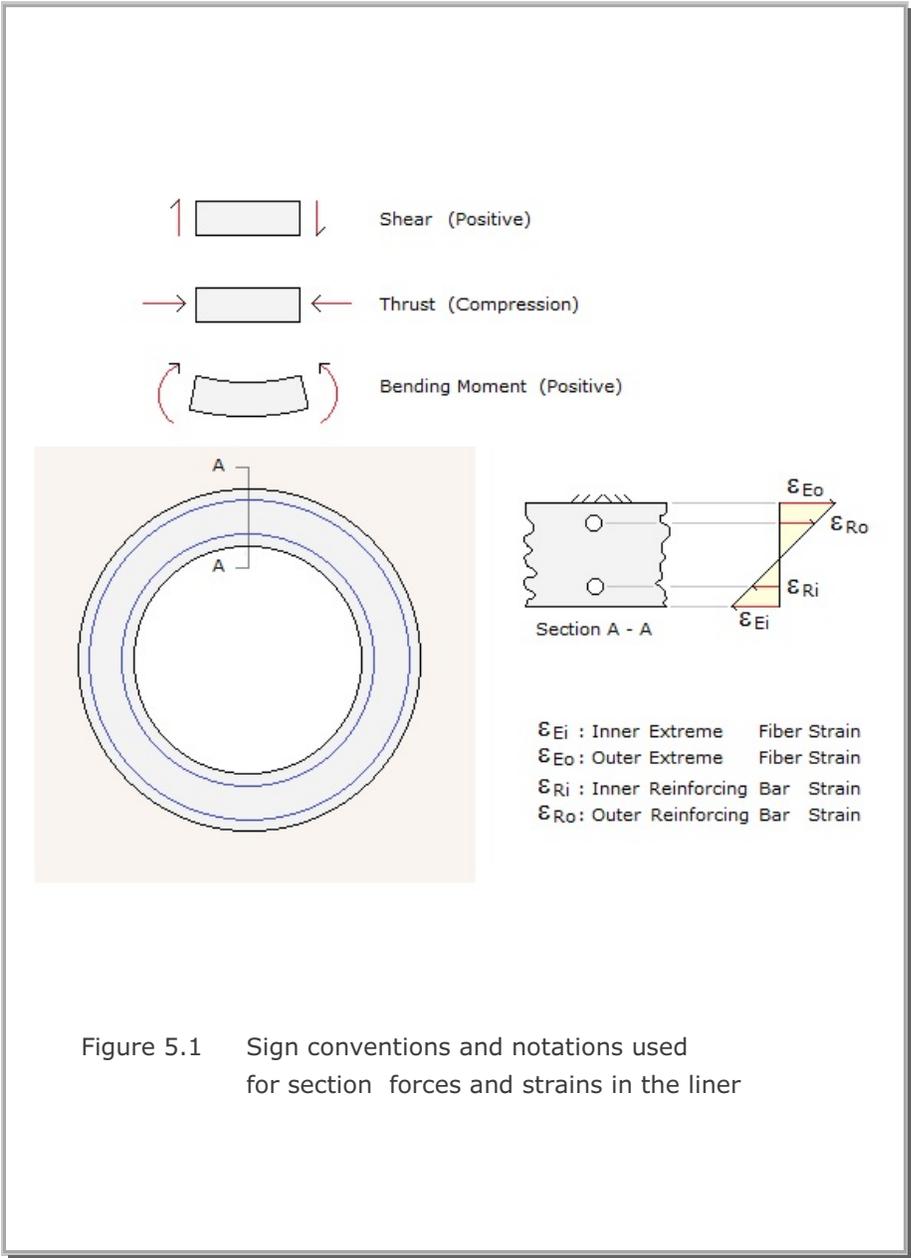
Sign conventions and notations used for section forces and strains in the liner
